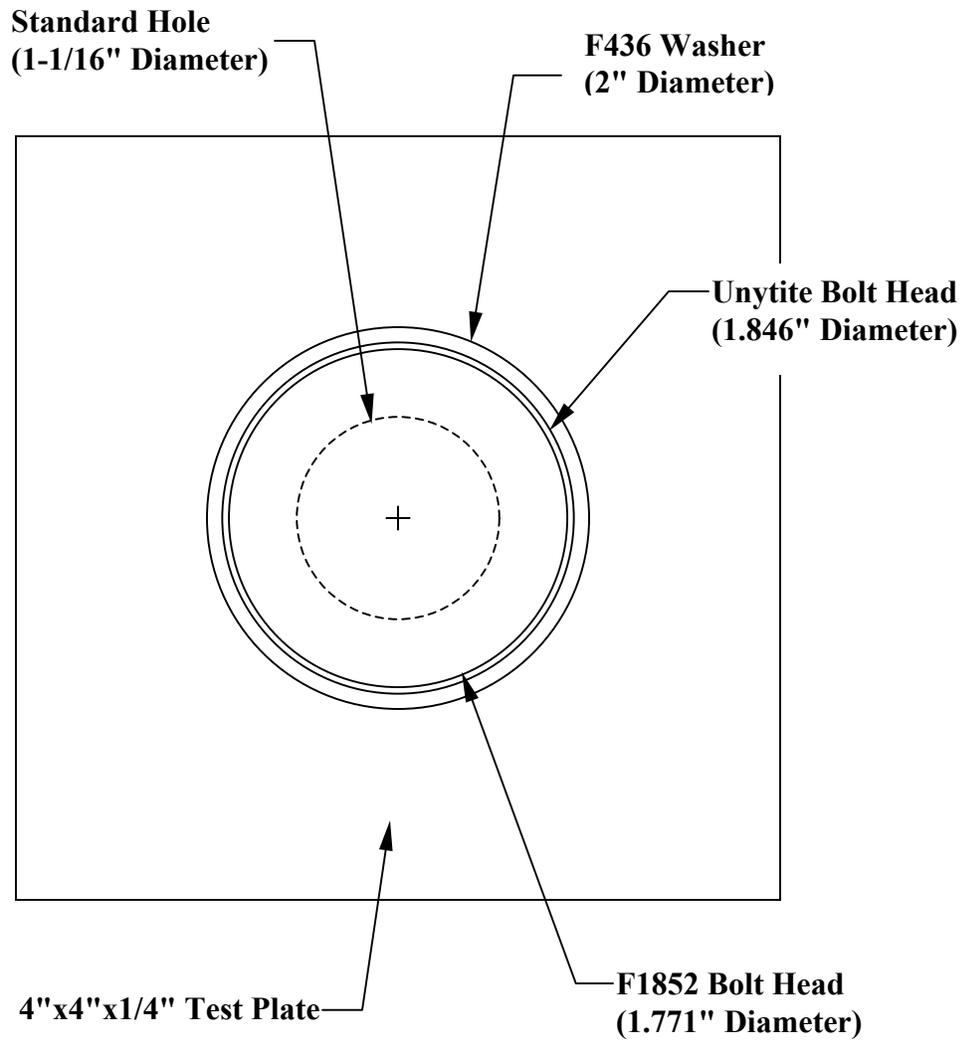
Bolt and Plate Layout for 1" Bolt in Standard Hole
